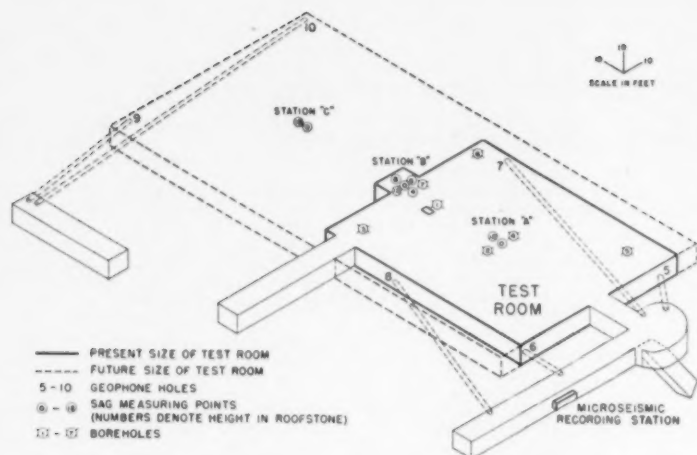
Isometric drawing of test room showing present and proposed size and recording installations.
